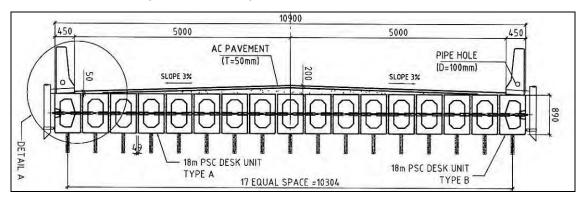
Typical Cross Section of PC Hollow Bride
